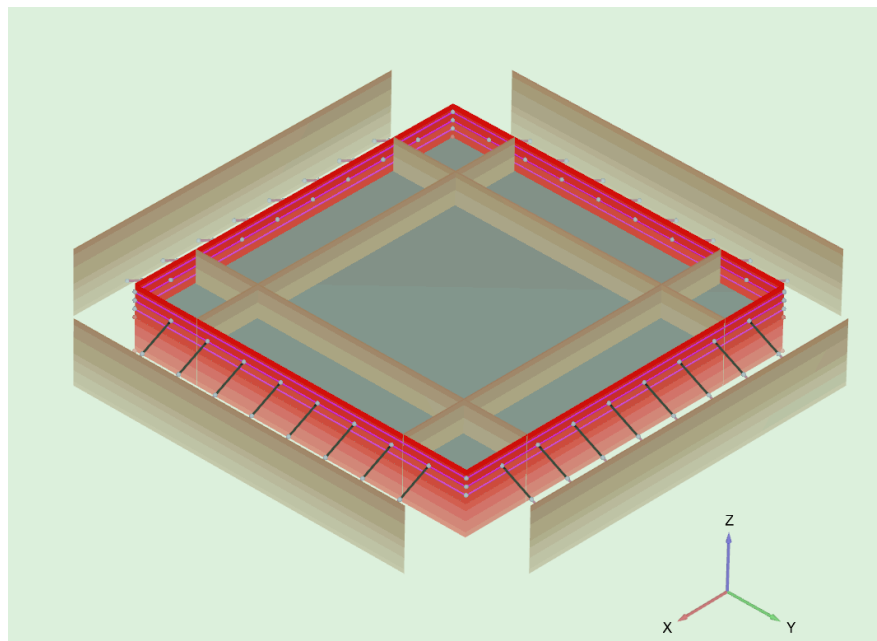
Excavation of the soil with the help of beams and sheet piles
